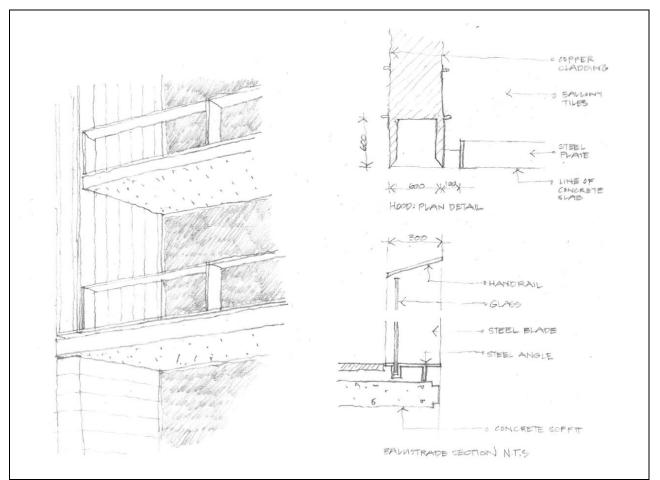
Extract of approved balustrade detail referred to in Condition A4.
